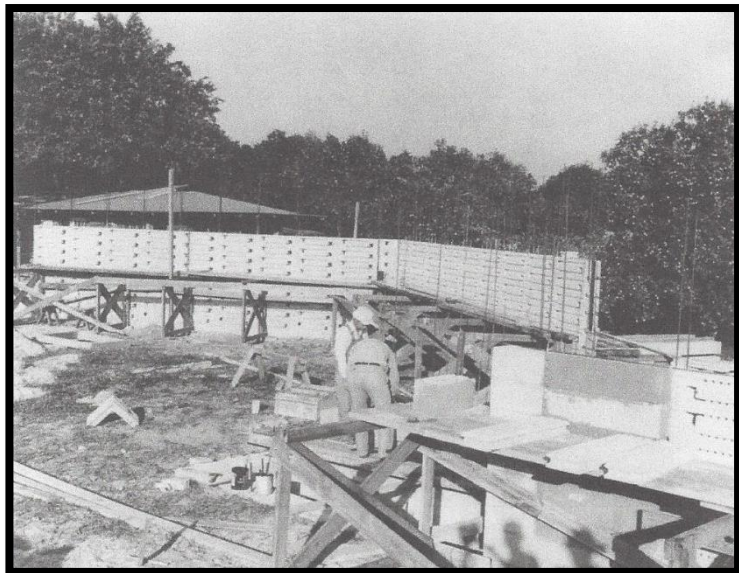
Construction site of Annie M. Pfeiffer Chapel. Blocks stacked together vertically and horizontally with steel reinforcement. *The Frank Lloyd Wright Foundation, Photograph no. 3816.040.
